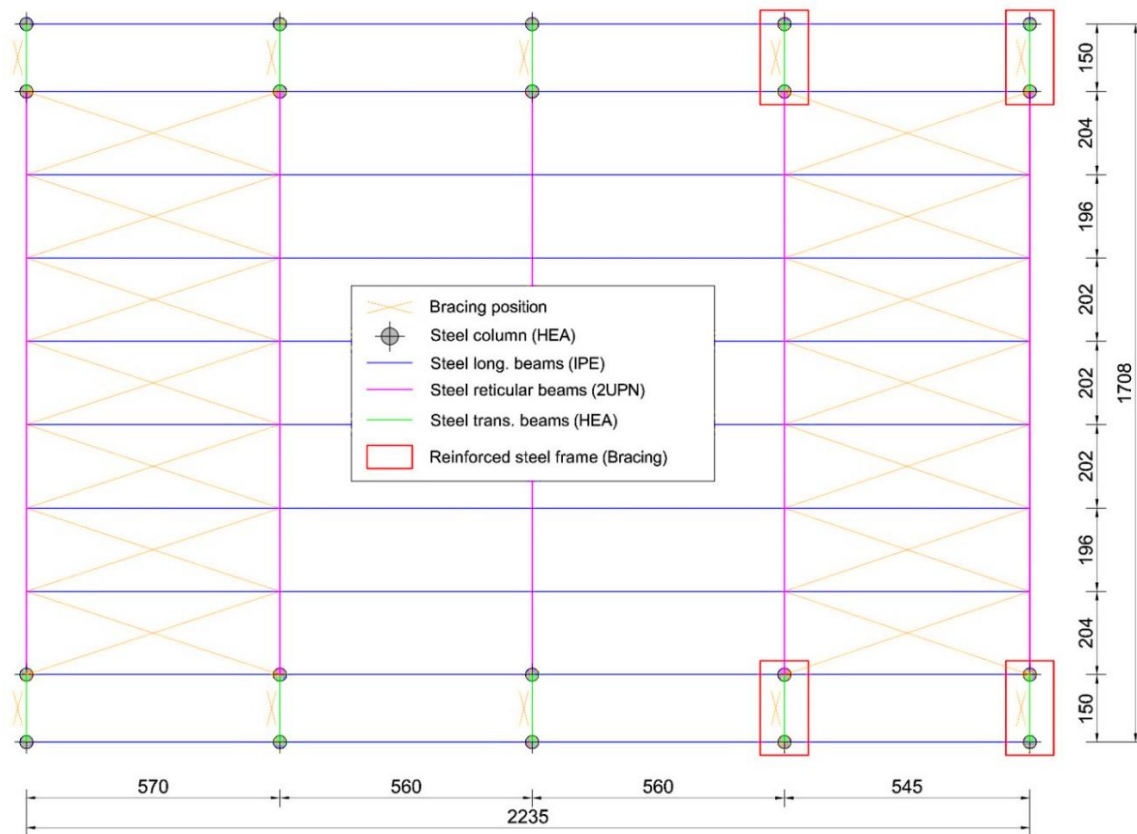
Planimetric scheme of the roof-extension, with truss beams, identifying the profiles used and indicating the positions of the bracing (cm as units)
